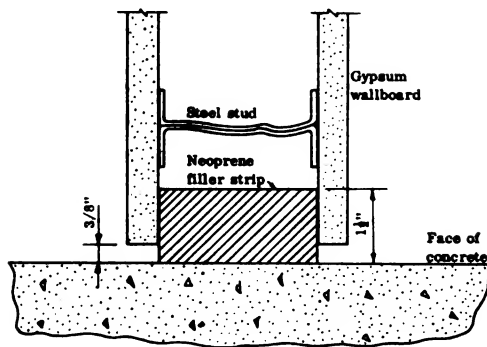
Sheraton-Universal Hotel. Detail of north-south partition control joint at vertical edges. Detail at top edge is similar.
